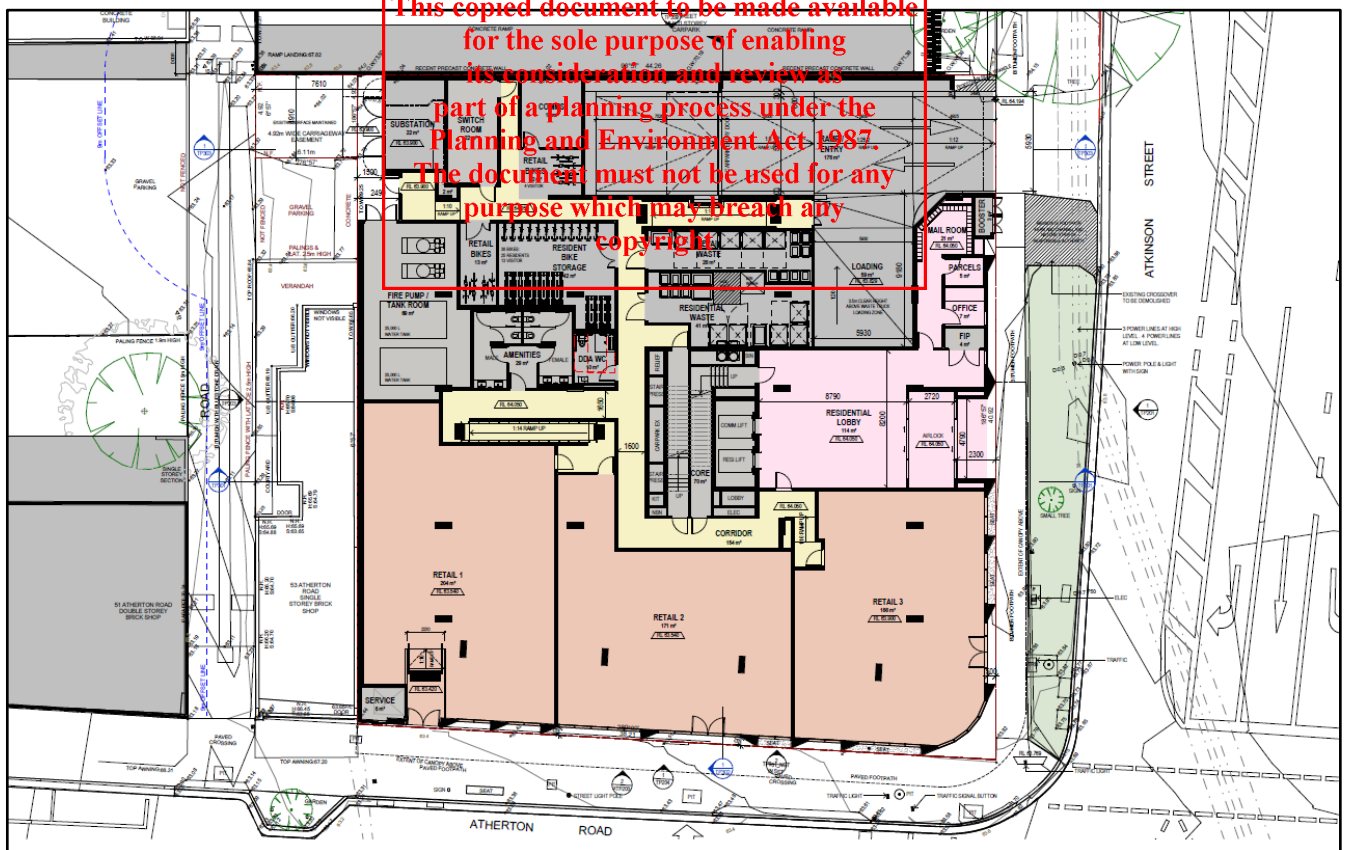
Proposed Site Plan/Ground Floor Plan (TP100 of the planning drawings).
